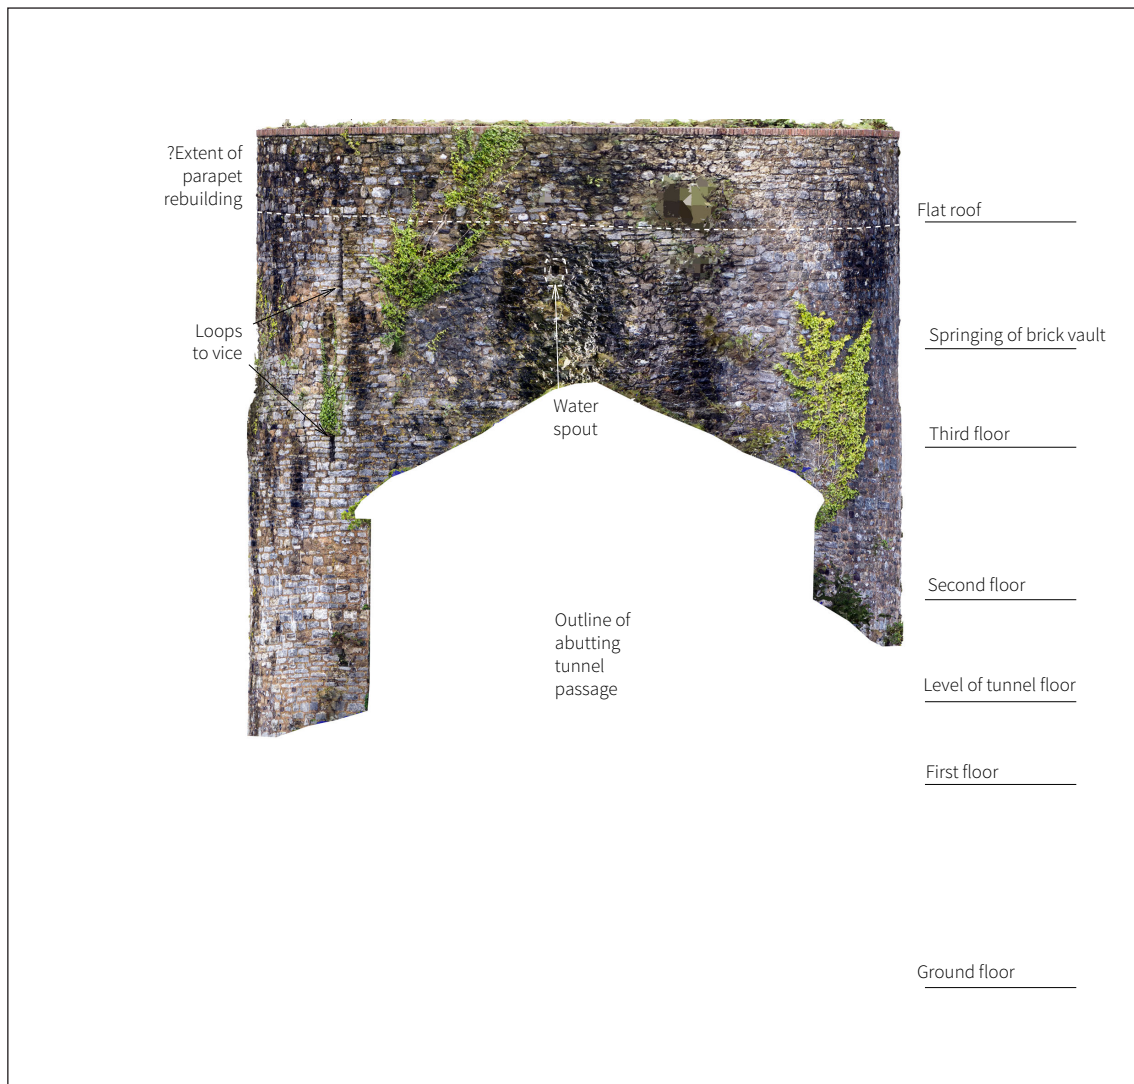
South elevation, St John's Tower (Photogrammetry courtesy of English Heritage)
